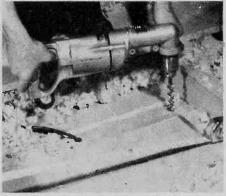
A heavy-duty electric drill makes the job easier, but a standard workbench ¹/₄₋, ³/₈₋ or ¹/₂-in. chuck electric drill will do the job. Here, the author is drilling from the attic into a wall below through the top plate. Studs are easy to spot from above because nailheads holding studs in place appear every 16 inches.
